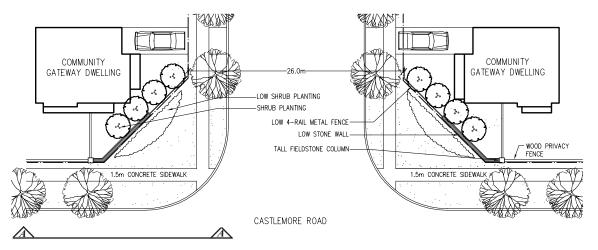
Concept Neighbourhood Gateway Plan
